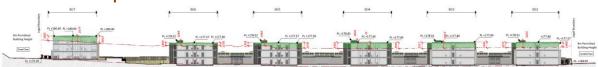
Section through the buildings Facing the Scapa Terrace Properties showing the proposed building heights vs the "Permitted Building Height"
